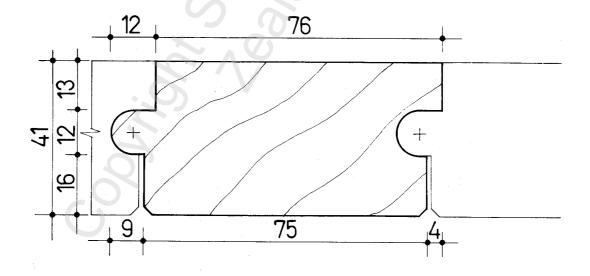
100 mm x 50 mm TONGUE AND GROOVE SECRET NAIL FLOORING (full size)
